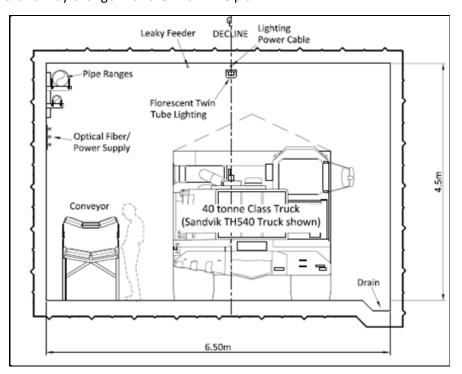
Schematic arrangement layouts of conveyor tunnel and truck vehicles
